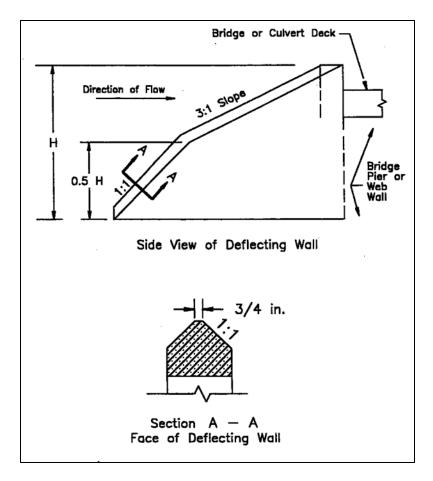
Debris deflecting wall on upstream face of bridge pier or concrete culvert web wall
